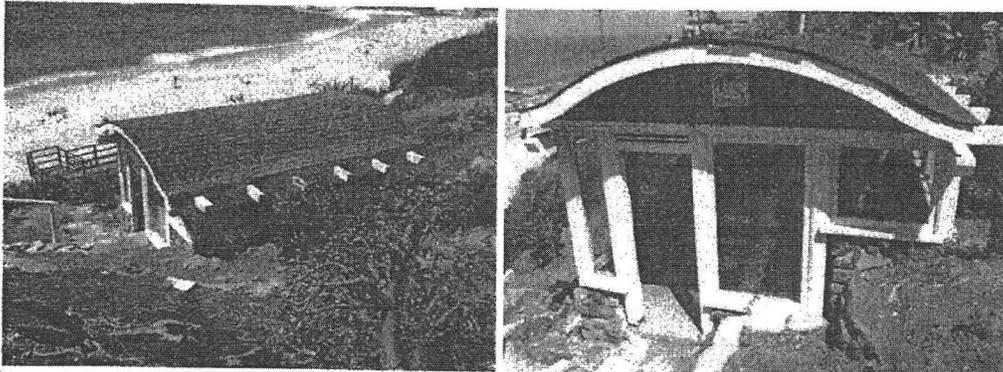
(Left): View of the cabana looking down hillside toward beach; the redwood stairs are located to the left of the cabana. This view shows the orientation of the cabana to the bluff, the extended purlins, and the asphalt roofing material. Figure 2 (Right): View of south facing elevation showing the barrel vault ceiling, redwood framing, and windows. The structure is constructed into the hillside.
